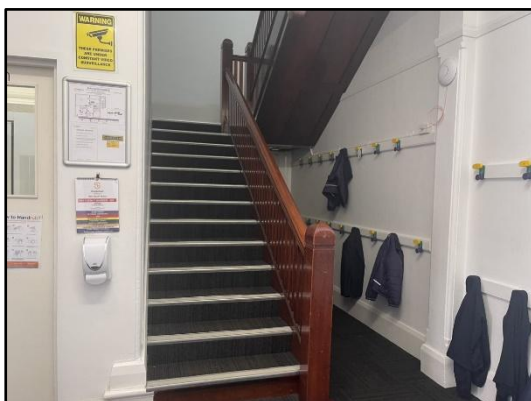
Internal view to the timber staircase, on the Ground Floor.
